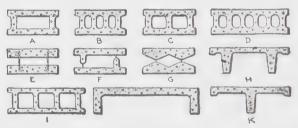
Horizontal cross sections of representative types of concrete block.
